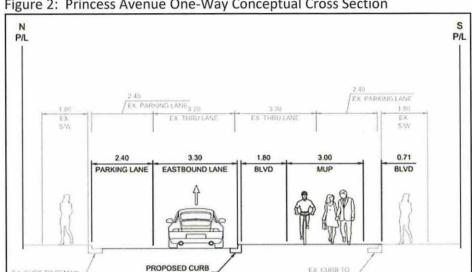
Princess Avenue One-Way Conceptual Cross Section
